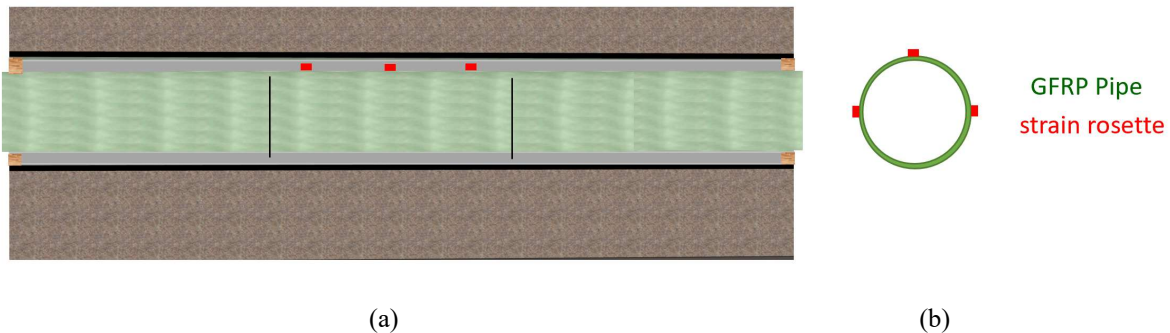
Schematic of the GFRP pipe instrumentation. Longitudinal (a) and transversal (b) view.
